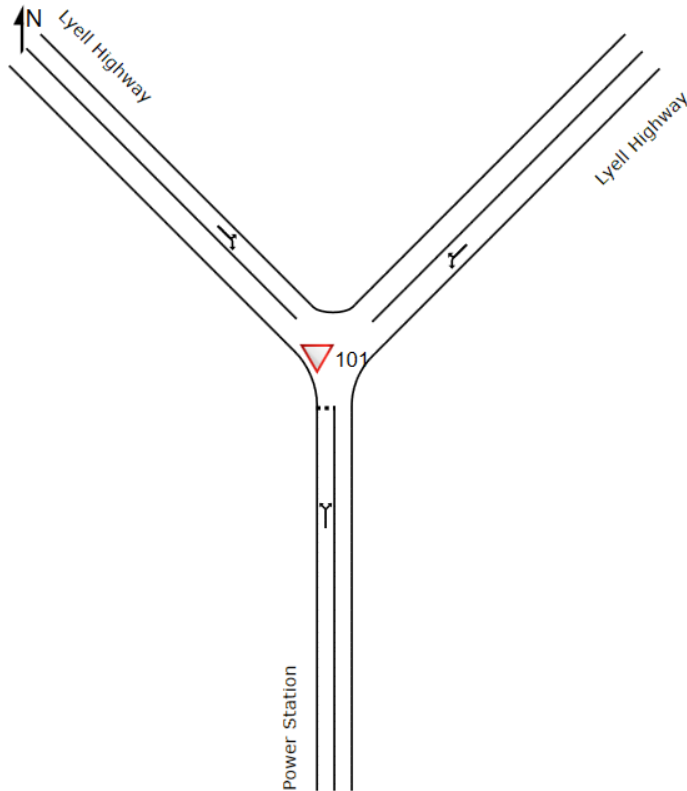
Geometric layout – Lyell Highway/ Tarraleah Power Station intersection
